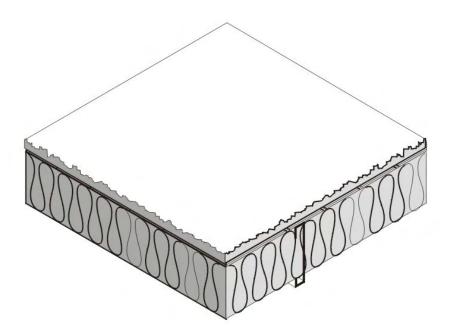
Metal Framed Floors with a Crawl Space
